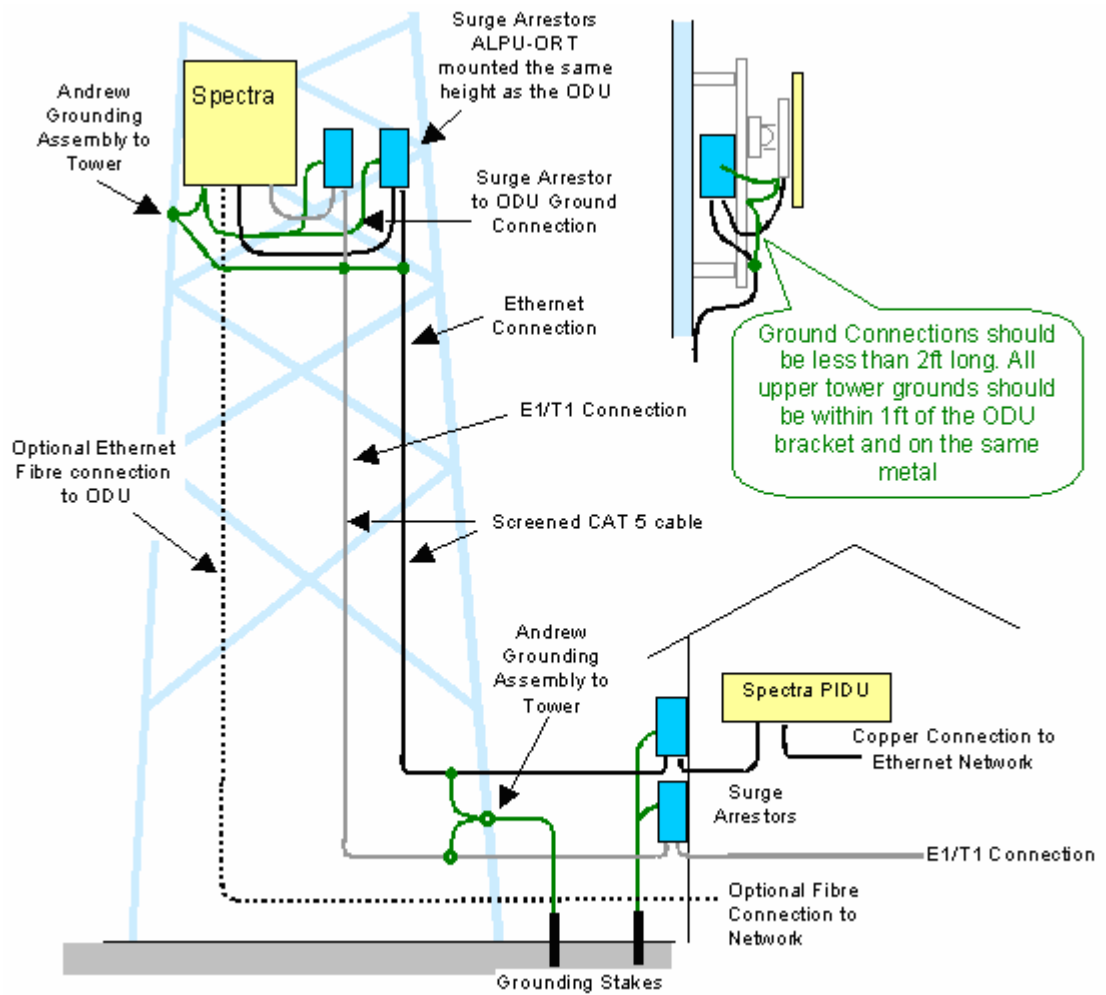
Typical Mast Installation with the addition of the E1-T1 cable
